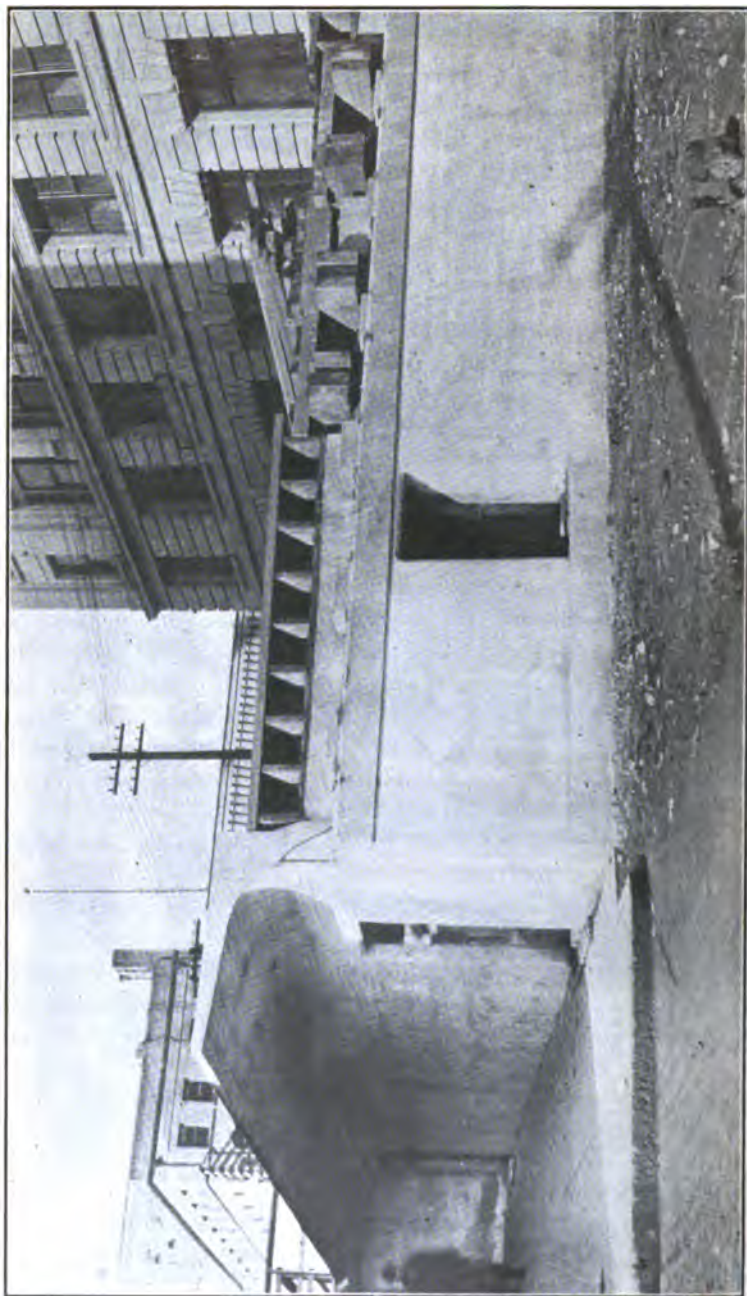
REINFORCED CONCRETE ABUTMENT, TACOMA.
